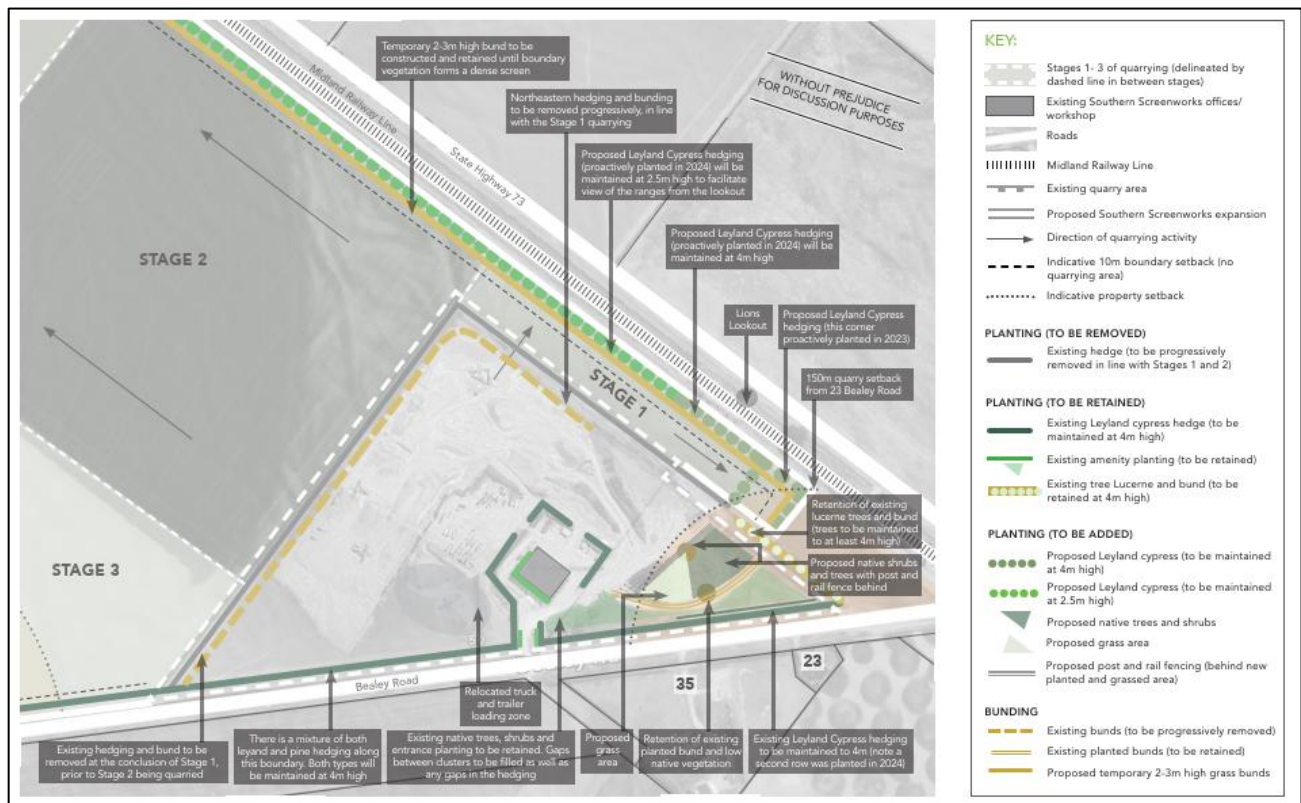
Proposed Landscape Mitigation Plan for Stages 1 and 2 (Source: Applicant)
